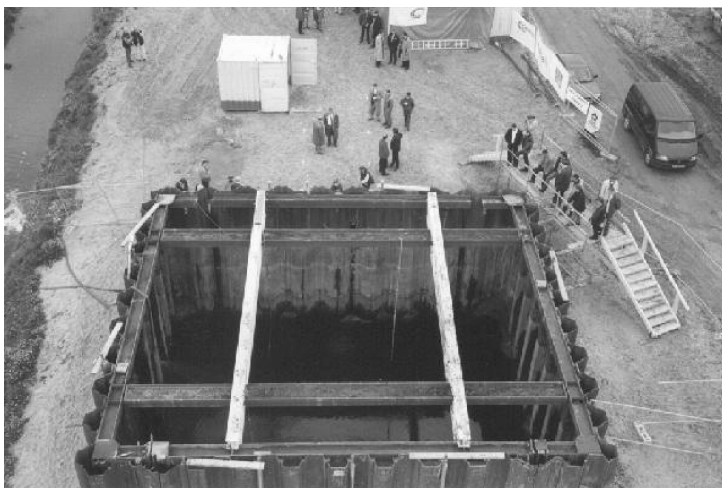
Rotterdam sheet pile wall field test (May 11 1999)
